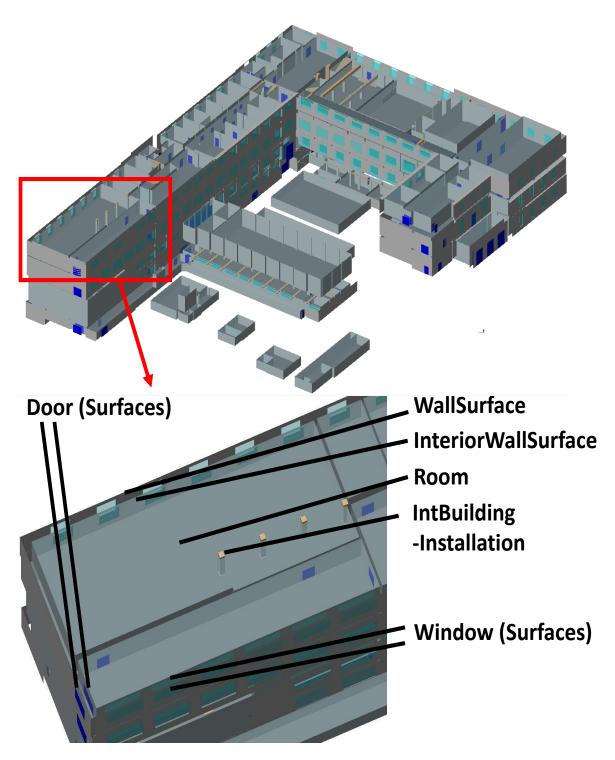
The CityGML building model and a close view of a room which shows room's CityGML feature types.
